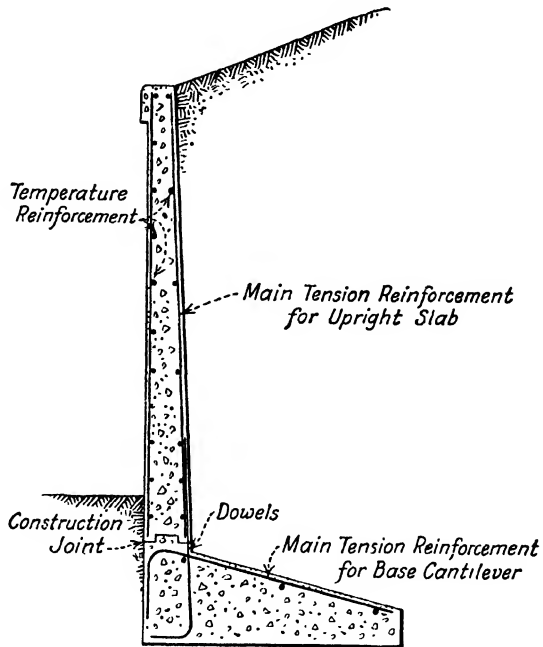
L-shaped Retaining Walls. (See p. 862.)
